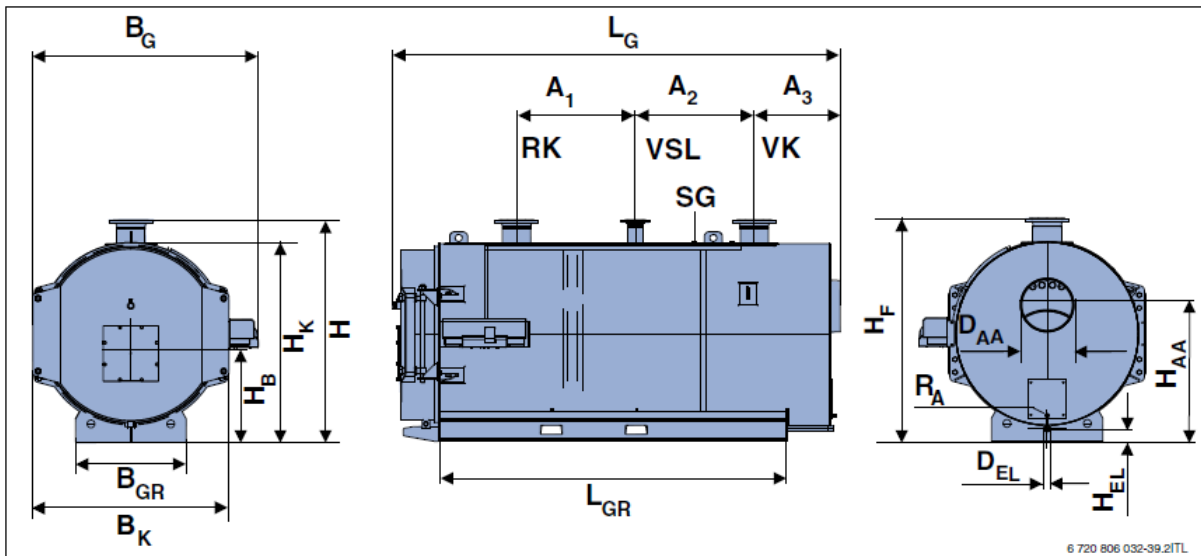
Dimensions, Uni 3000F 1400 kW and 1850 kW
